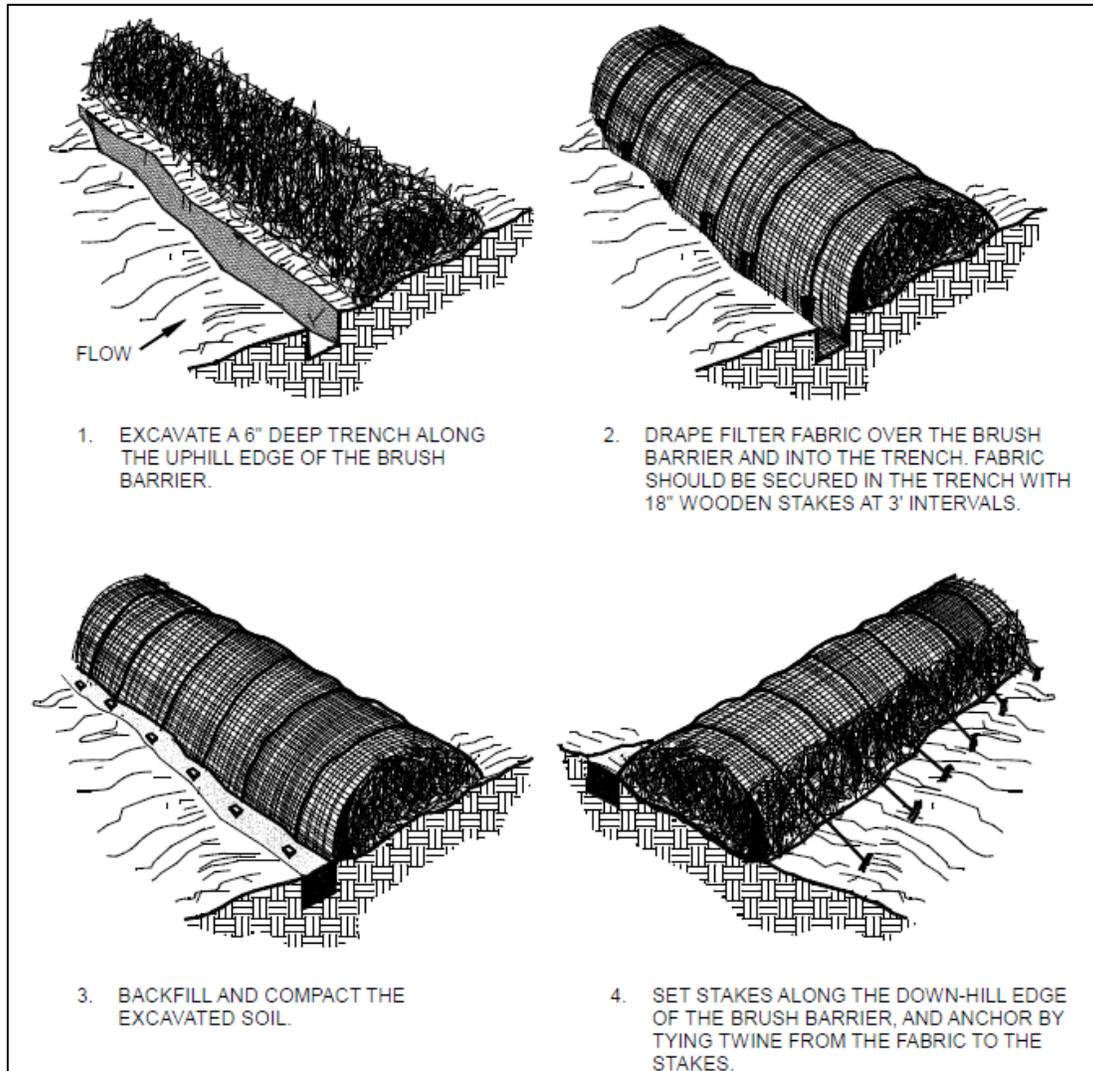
A: Typical brush fabric barrier construction details. Adapted from VDEQ (2024).
